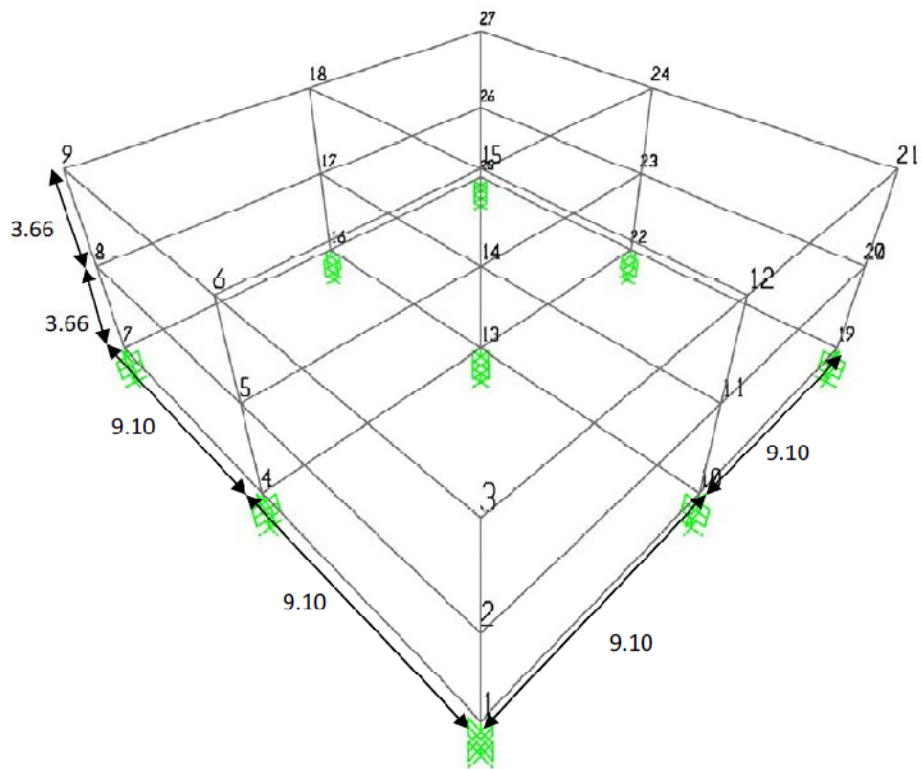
Structural model of Base Isolated Framed Structure (From SAP window)
